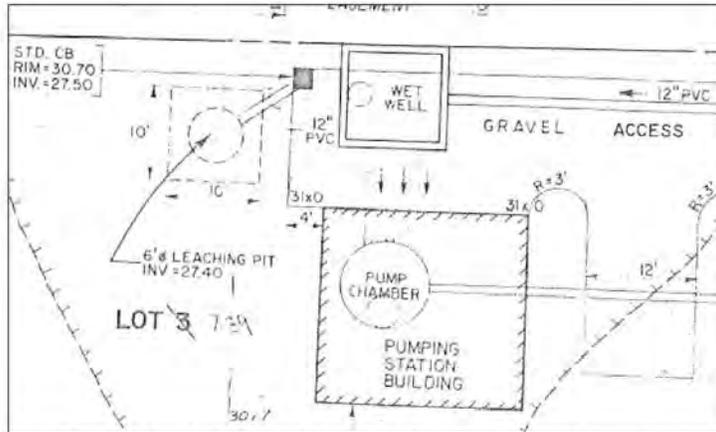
Plan view of South Valley Pumping Station site layout illustrating connections between the wet well and dry well.
